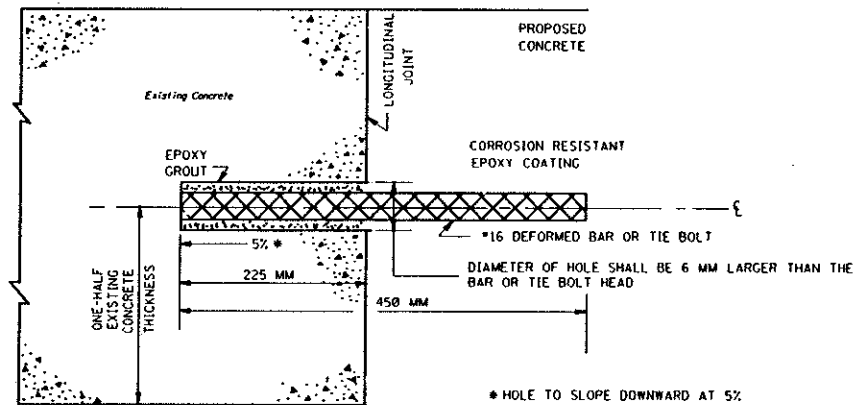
DETAILS OF JOINT BETWEEN EXISTING CONCRETE
